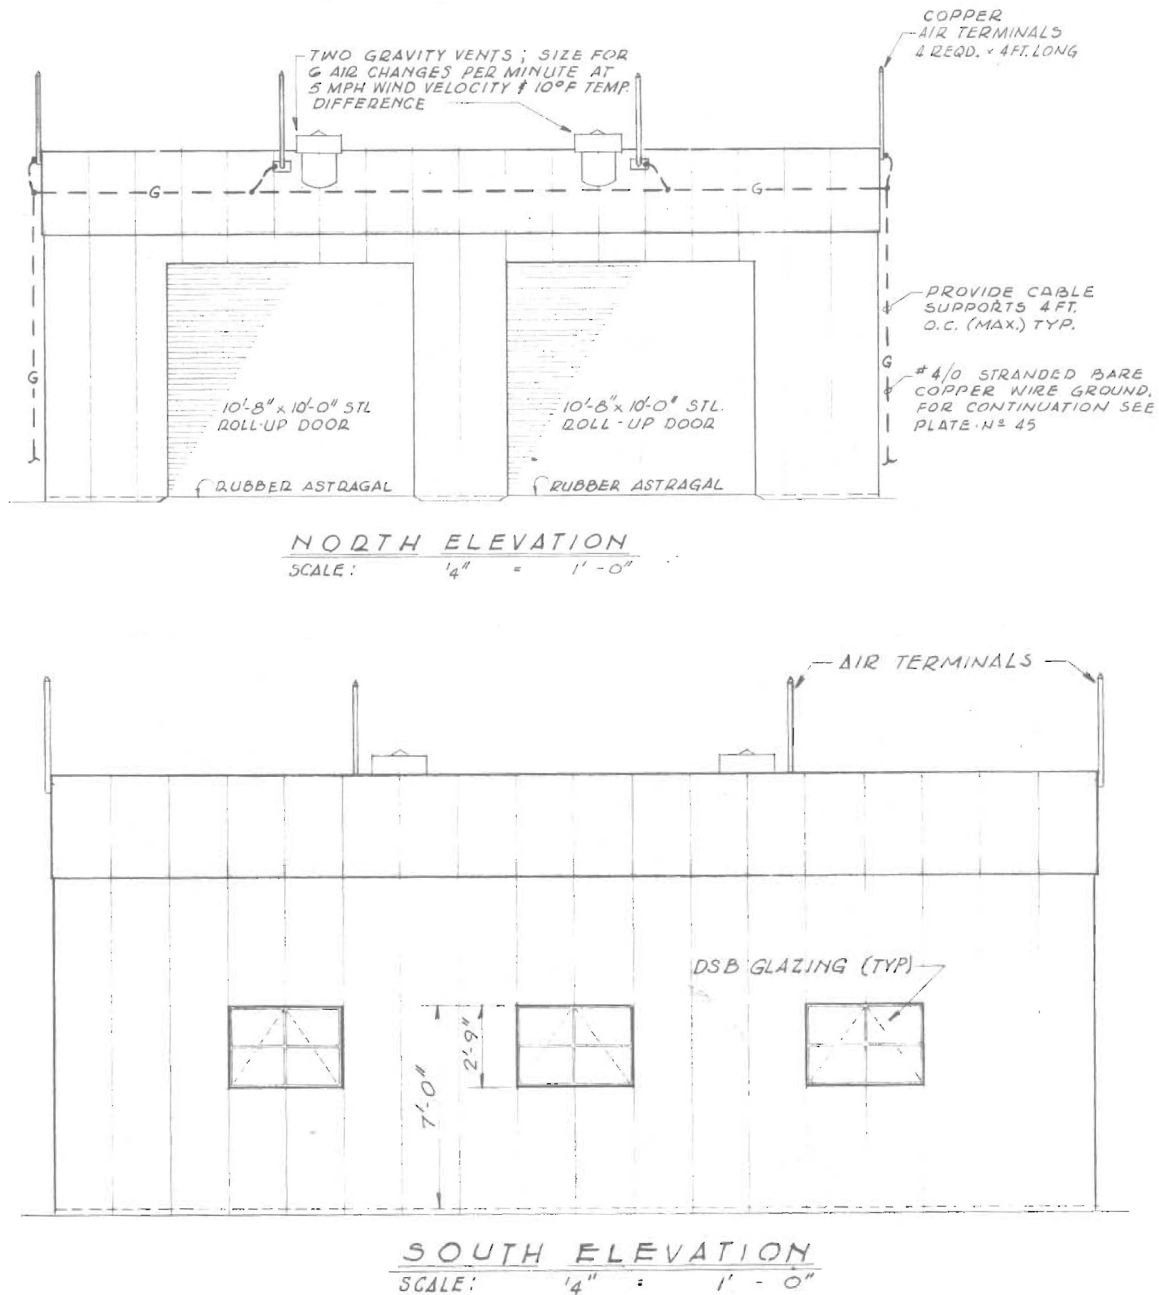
Balloon Support Building, north and south elevations from 1963 WS-KR plans.
